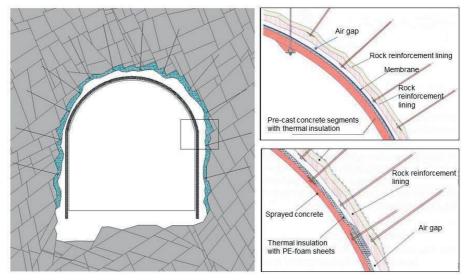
Layout of traditional Norwegian tunnel lining system with two options. A: shield system with thermally insulating pre-cast concrete elements. B: shield system with PE sheets (after NPRA 2012).
